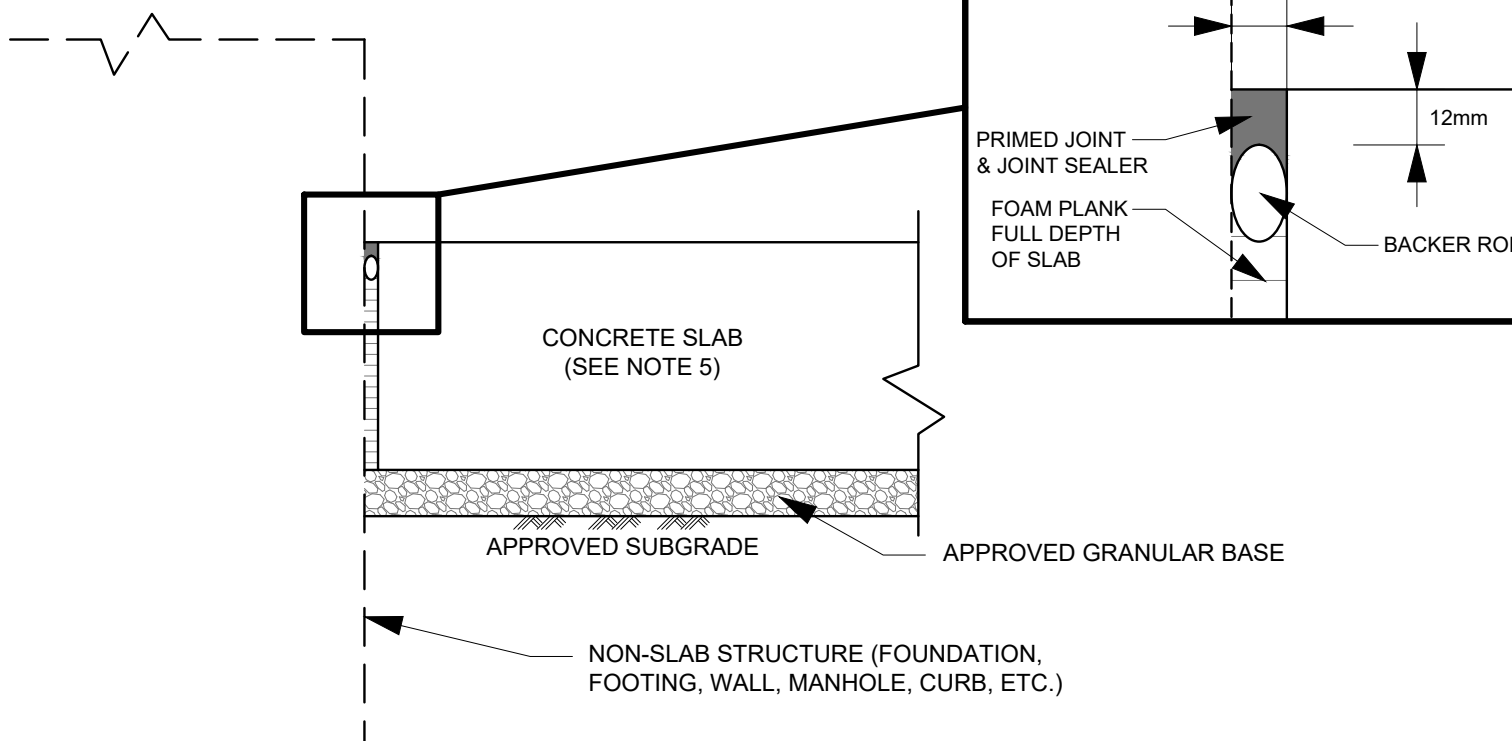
SLAB CONSTRUCTION JOINT:
